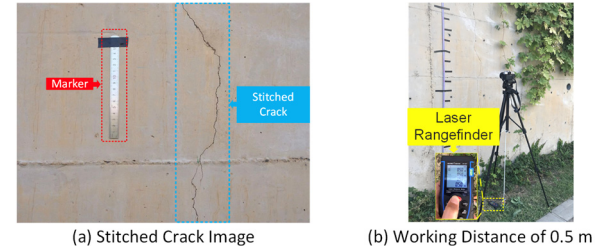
(a) The stitched crack in the concrete retaining wall; and (b) Picture of the working distance of 0.5 m
